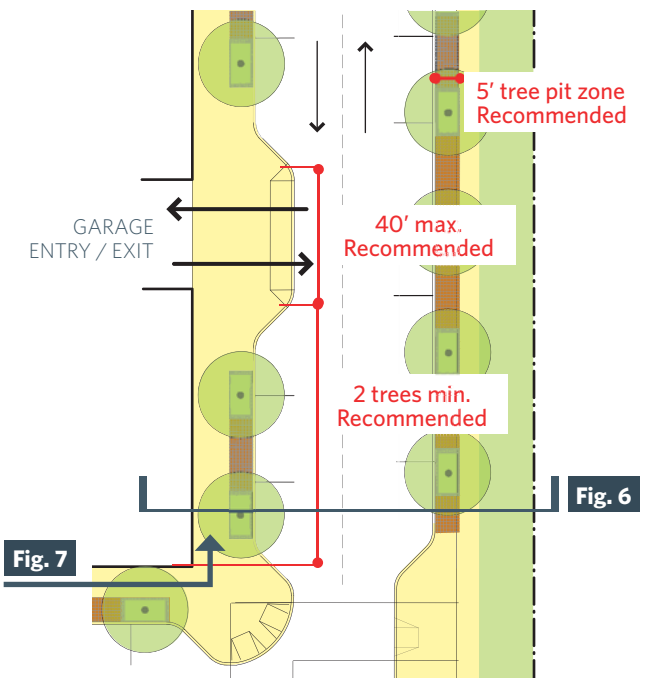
Typical plan and section of Northern Boulevard per SZD dimensional requirements
